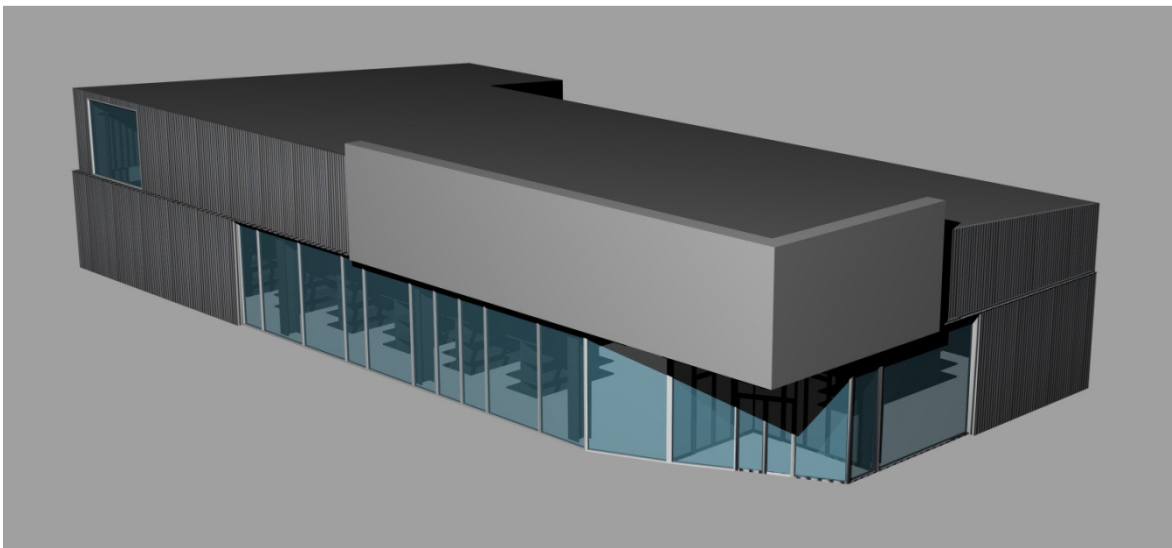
Case Study #1 – Typical Hot-Rolled Steel Structure Single-Storey Retail Building
